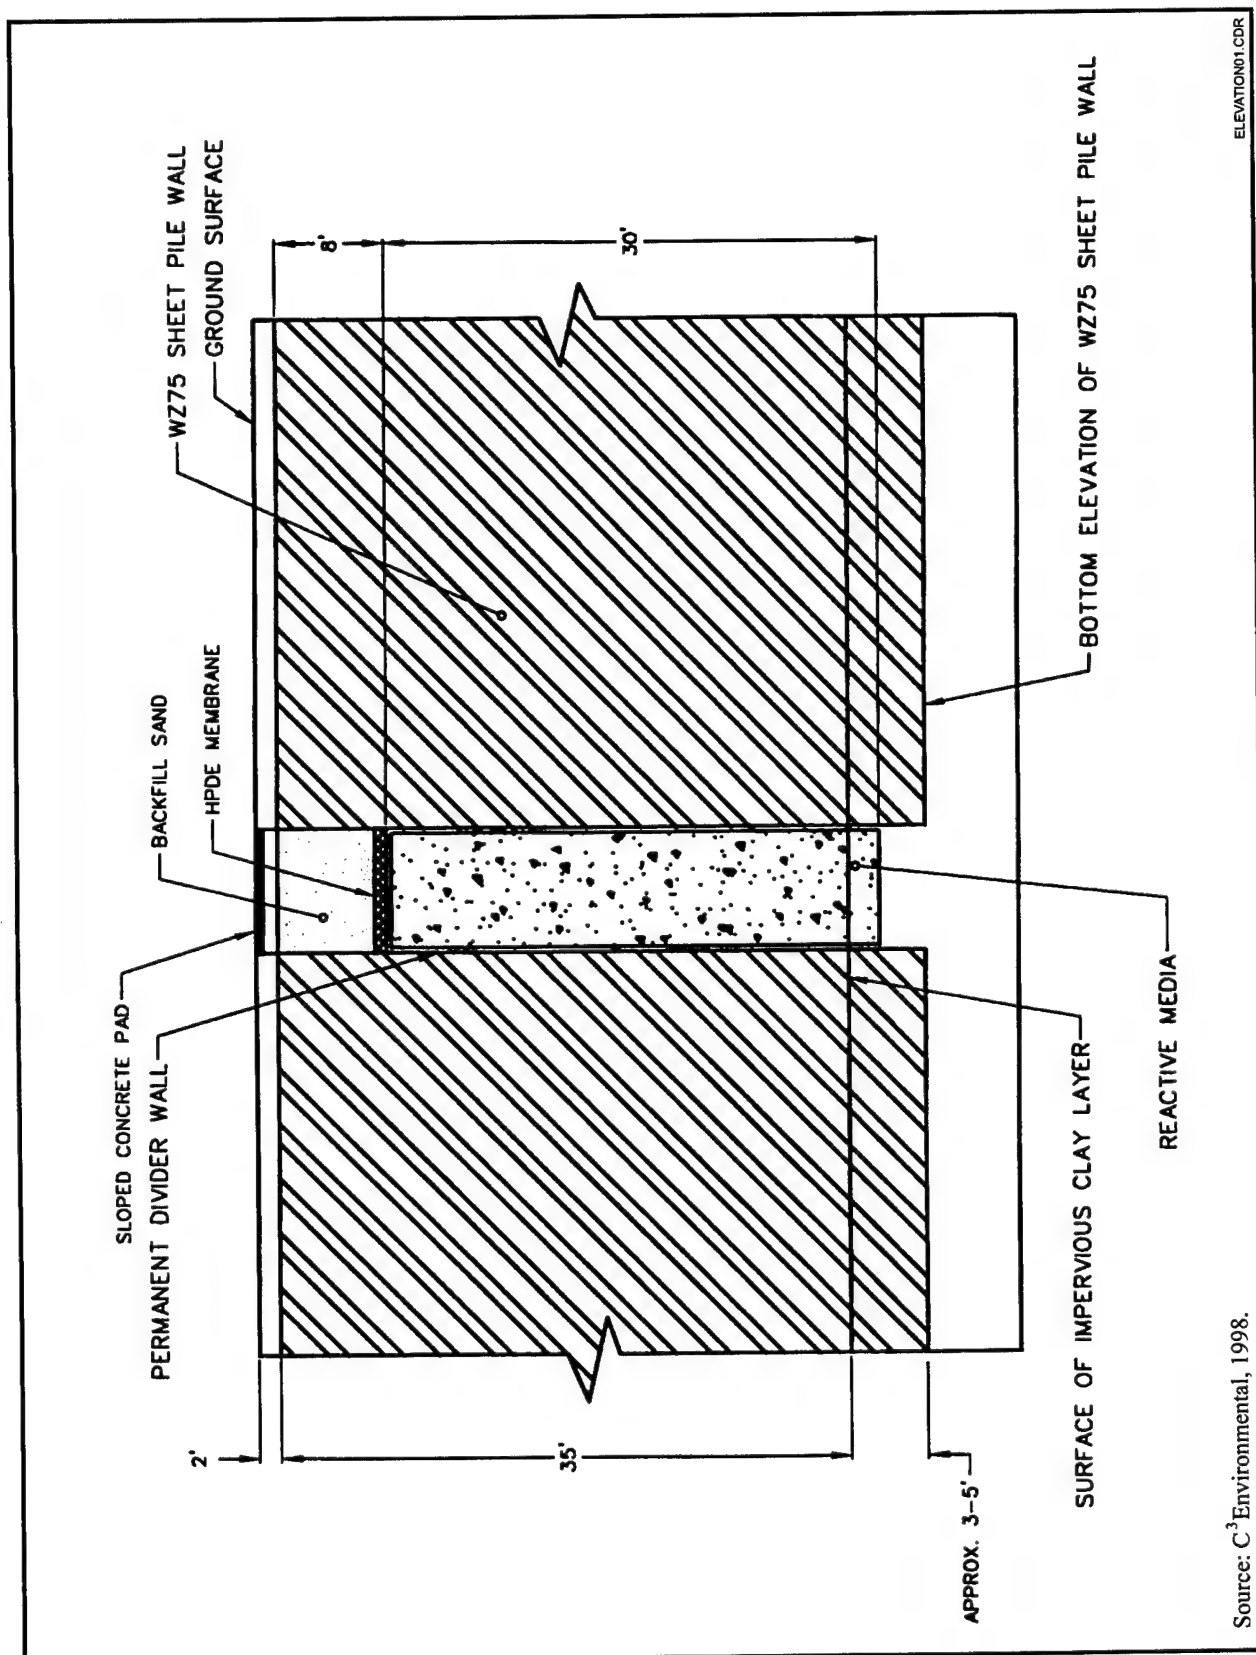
Elevation View of PRB Gate 1 and Funnel
